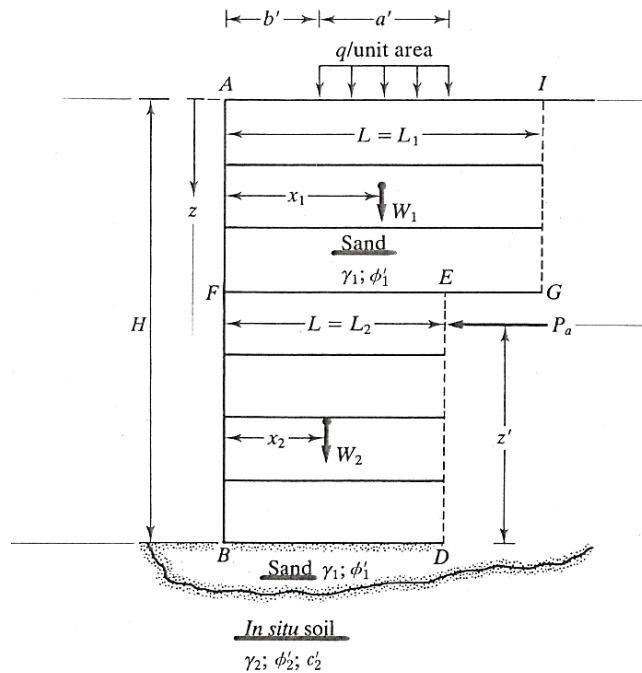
Typical Cross-Section of an MSE Wall (Das, 2015)
